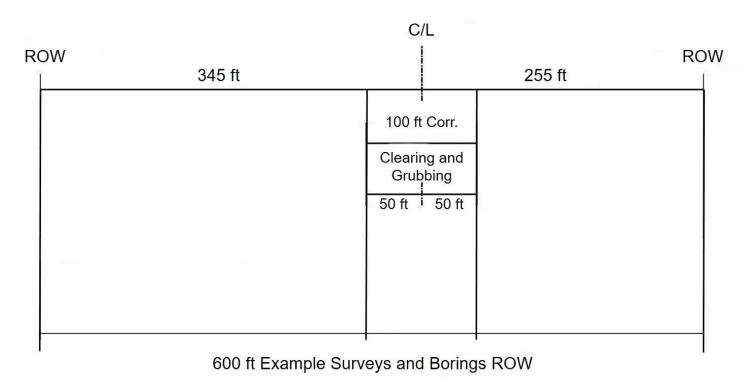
Plan view drawing of a typical ROW for the proposed action.
